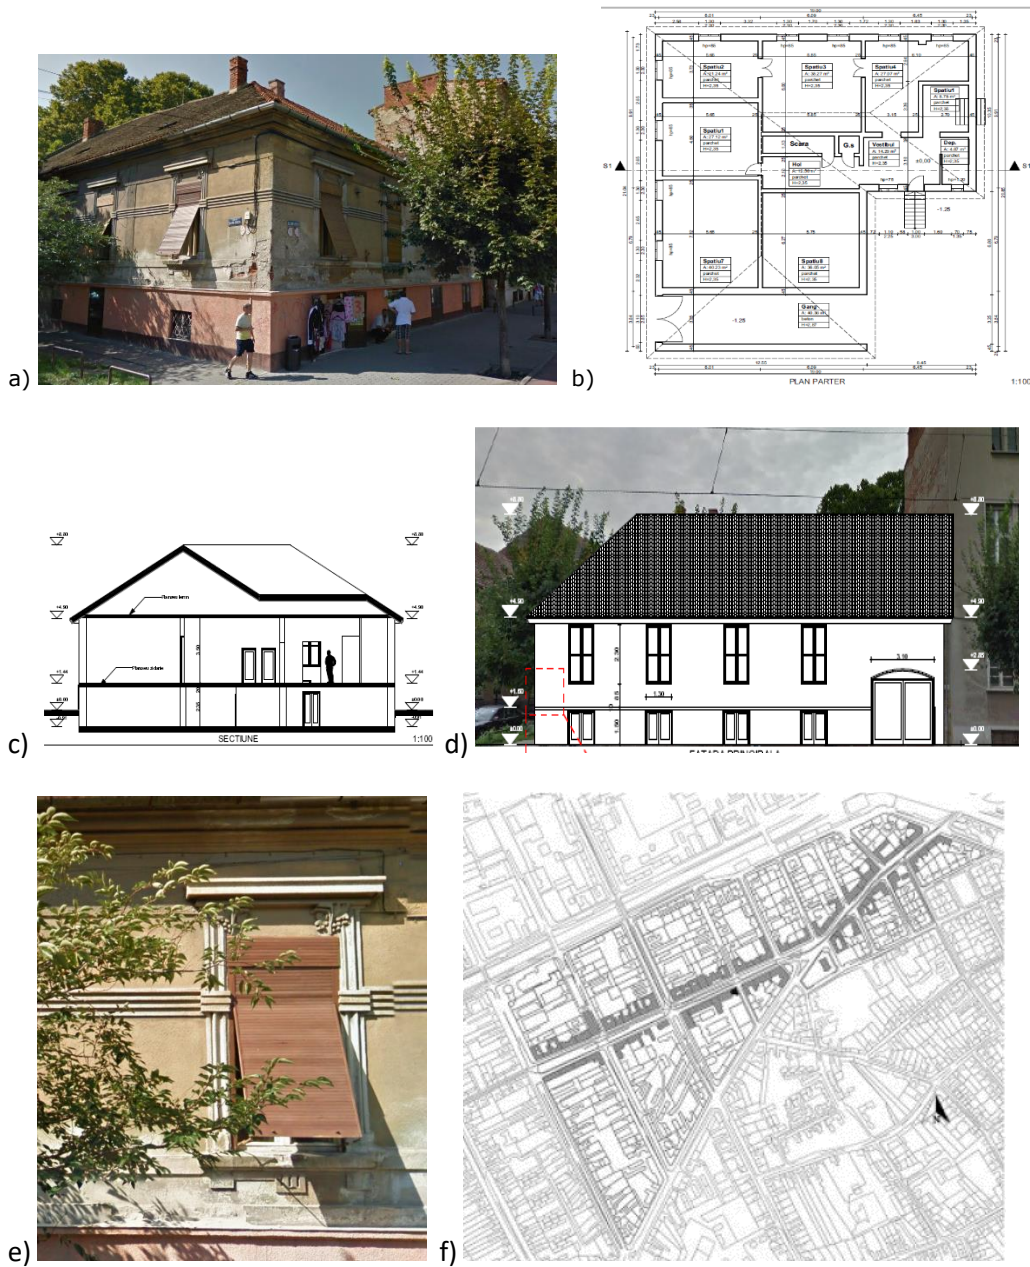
Typological class type I historical masonry buildings for Iosefin district: a) image of the buildings in the current state; b) ground floor plan; c) section; d) façade; e) architectural-artistic elements; f) location
